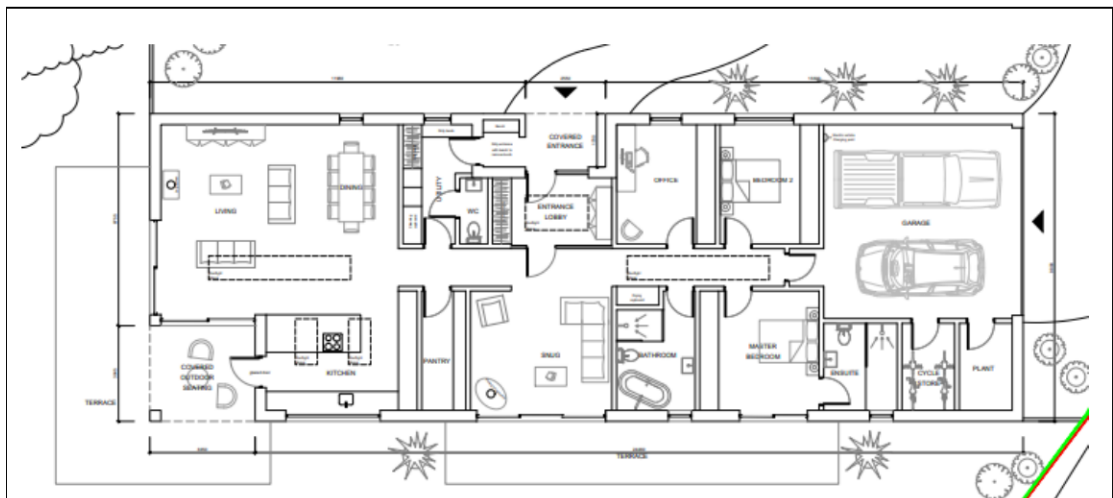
above: Envisaged layout of proposed building plus internal layout of new dwelling
